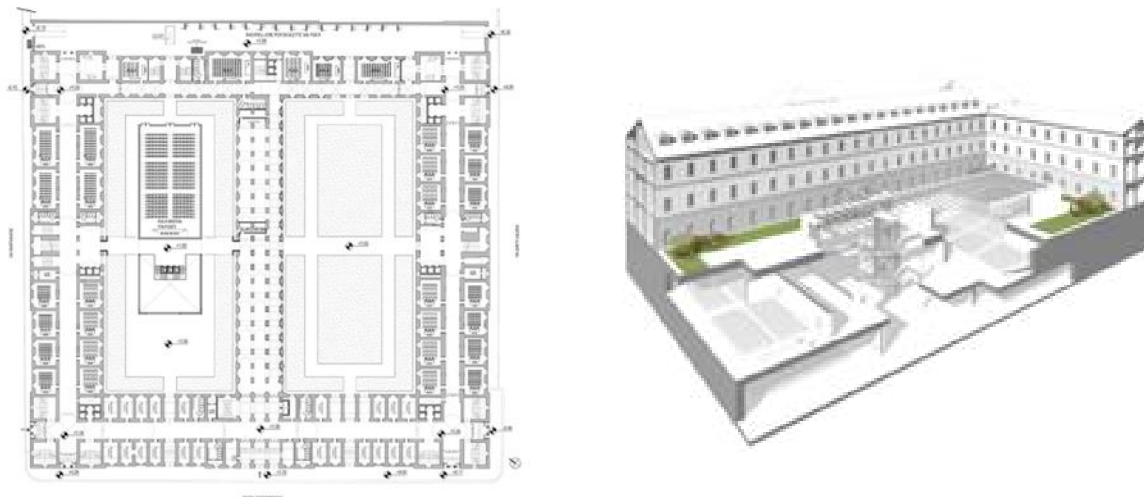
Ex caserma Garibaldi (new plan and 3D)
